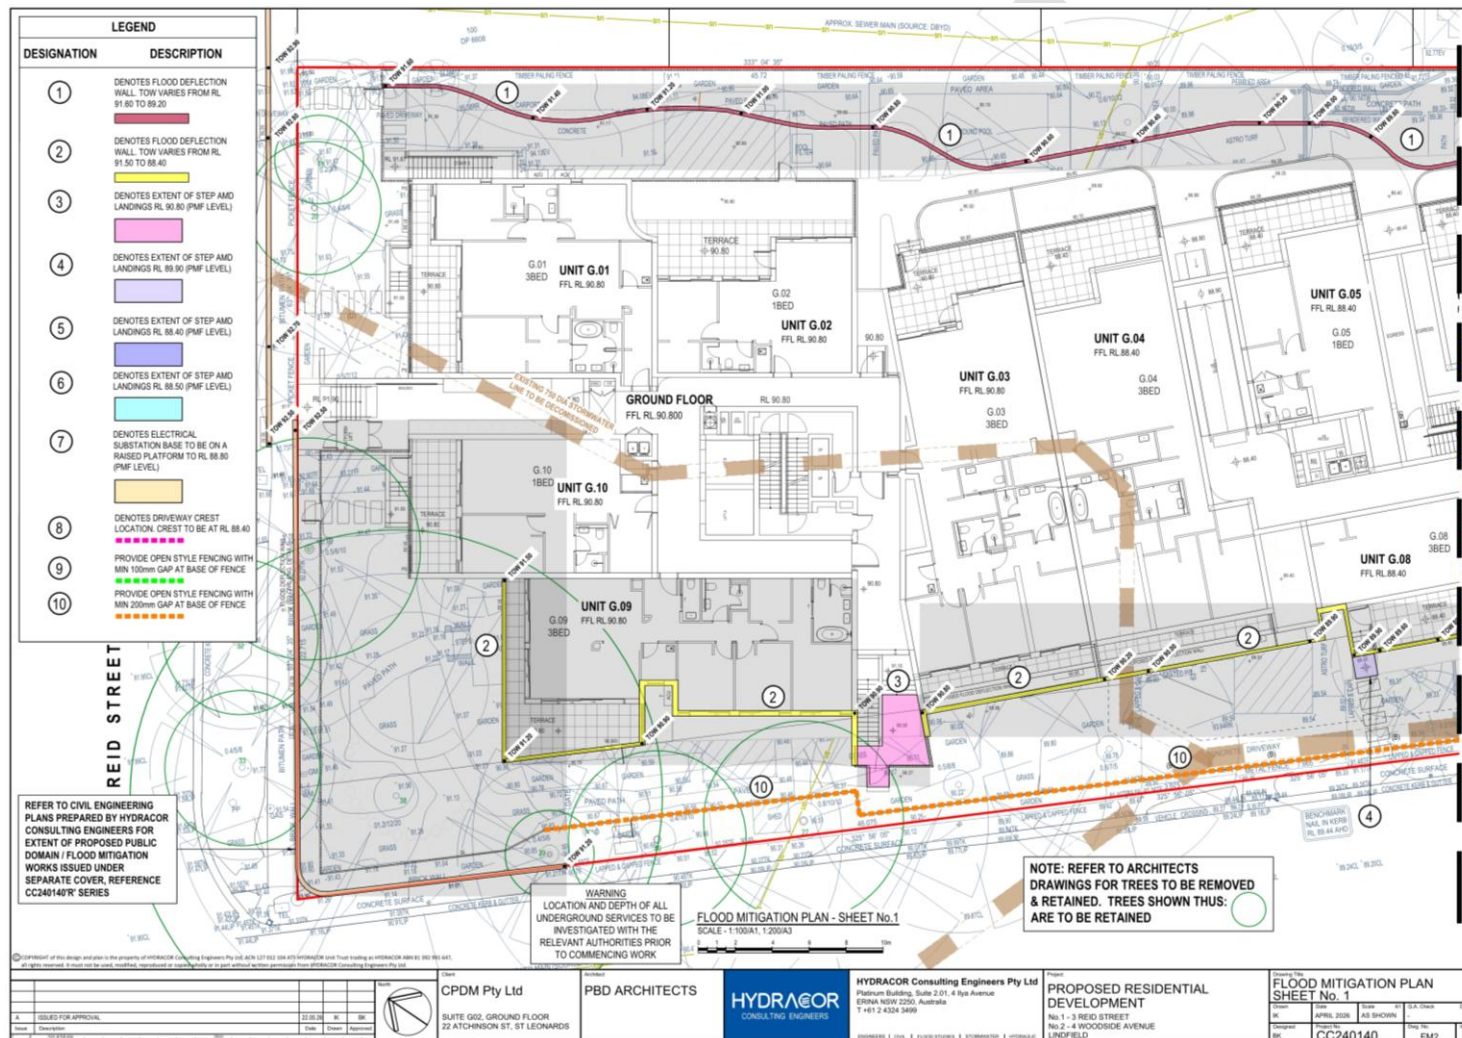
Flood Mitigation Plan – Sheet No. 1 (HYDRACOR, Issue A)
